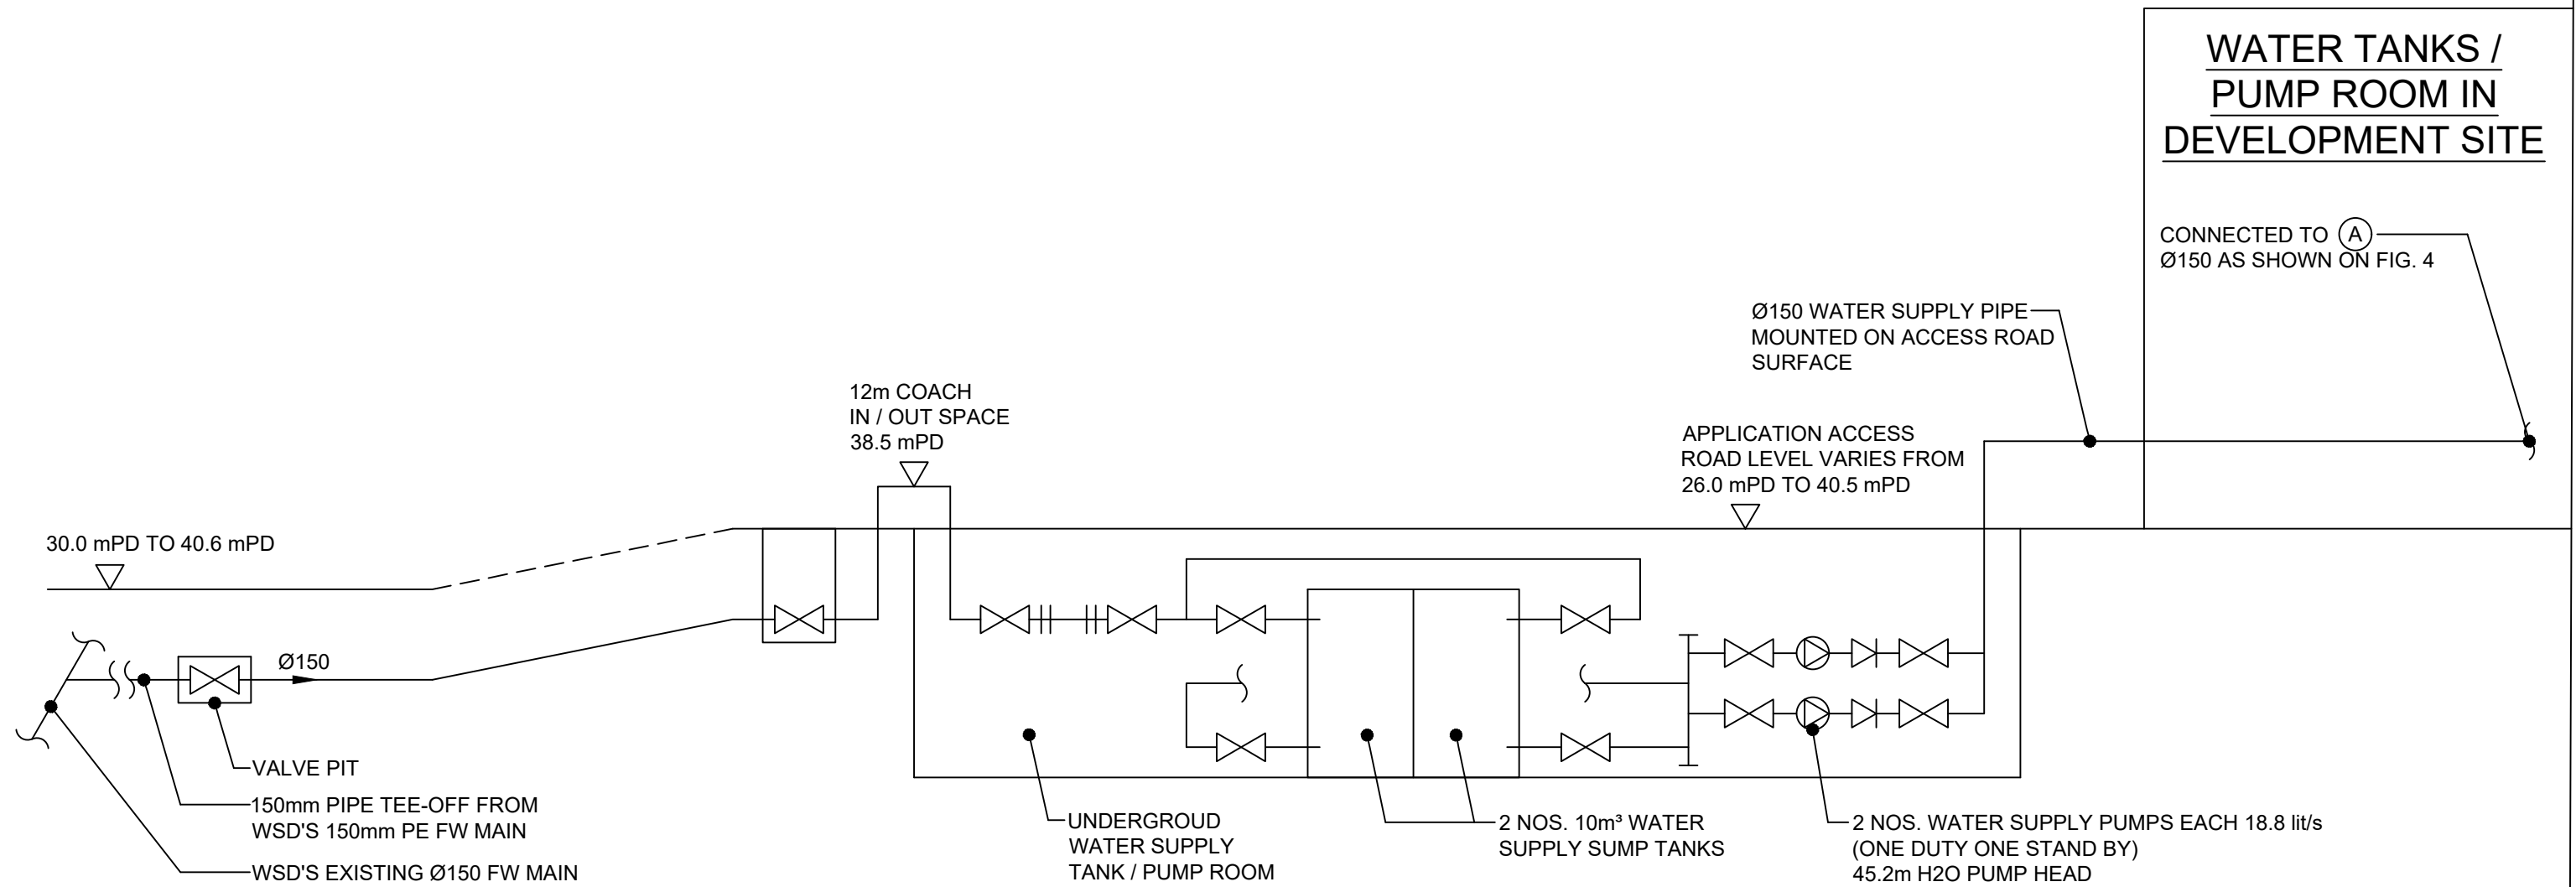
WSD Water Main Connection Point and Water Supply Pipe Layout Plan
